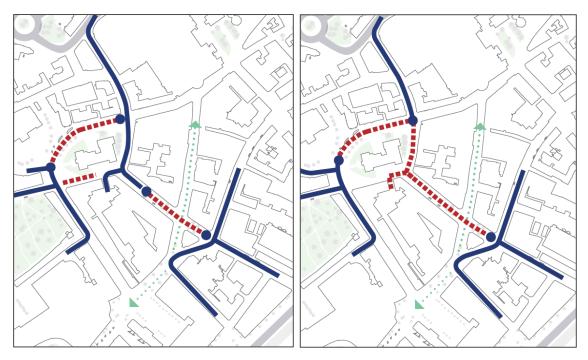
Existing and Proposed Road Layout at Commercial Street and Murraygate
